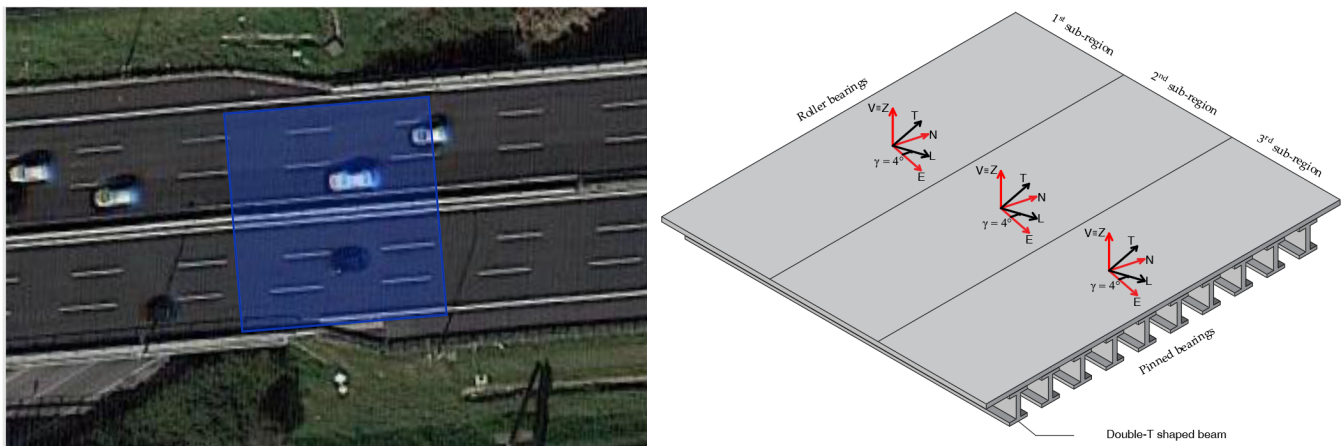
Single-span simply supported concrete girder bridge, Fiumicino, Rome (Italy) and a scale axonometric view. The single-span bridge, characterized by 10 double-T beams of equal sections is divided into three sub-regions (i.e., 1st, 2nd, and 3rd sub-region). The 1st sub-region is characterized by roller bearings, while the 3rd one by pinned bearings. Red and blue lines on the left of the deck represent the expected direction of free longitudinal displacements under constant temperature gradient ΔT_C .
